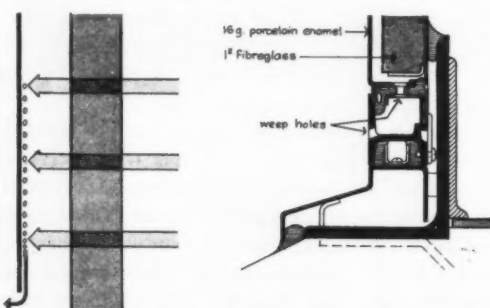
Prevention of interstitial condensation. 5, Drainage. (United Air Lines Finance Building, Chicago. Architects, Skidmore, Owings and Merrill.)
